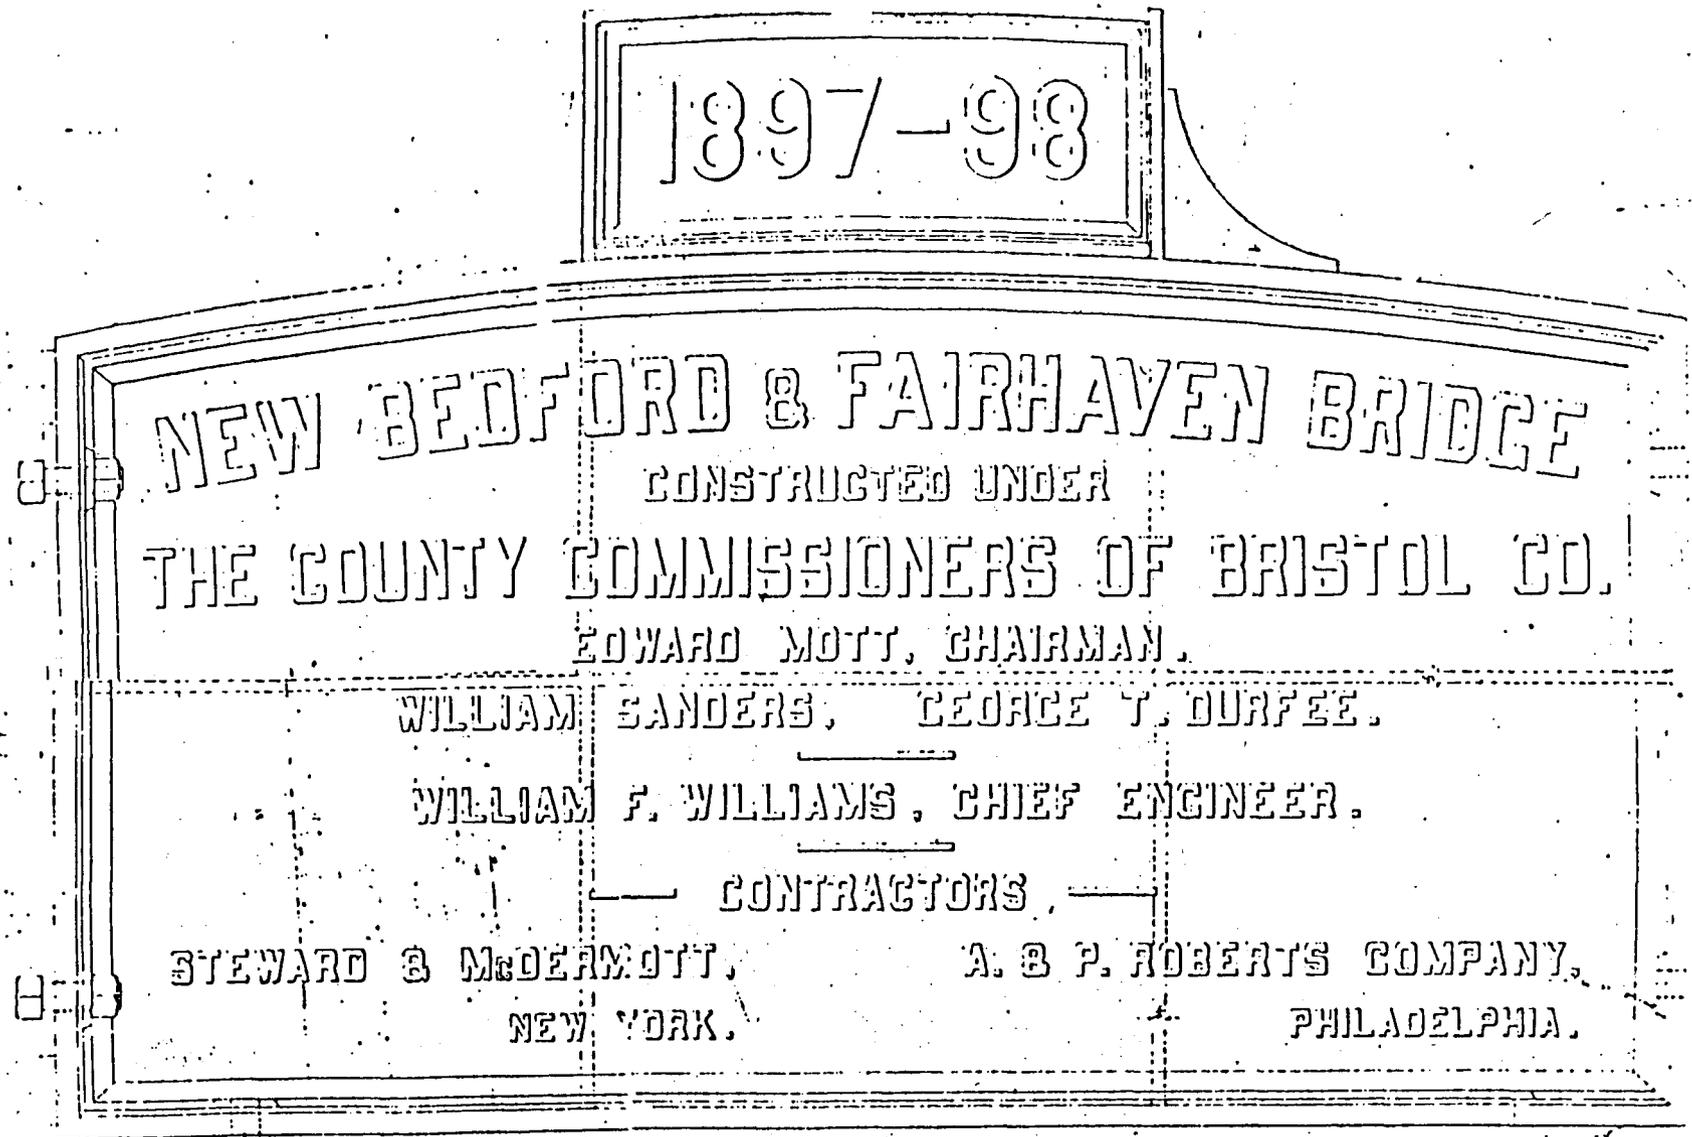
New Bedford-Fairhaven Bridge Builder's Plate.
